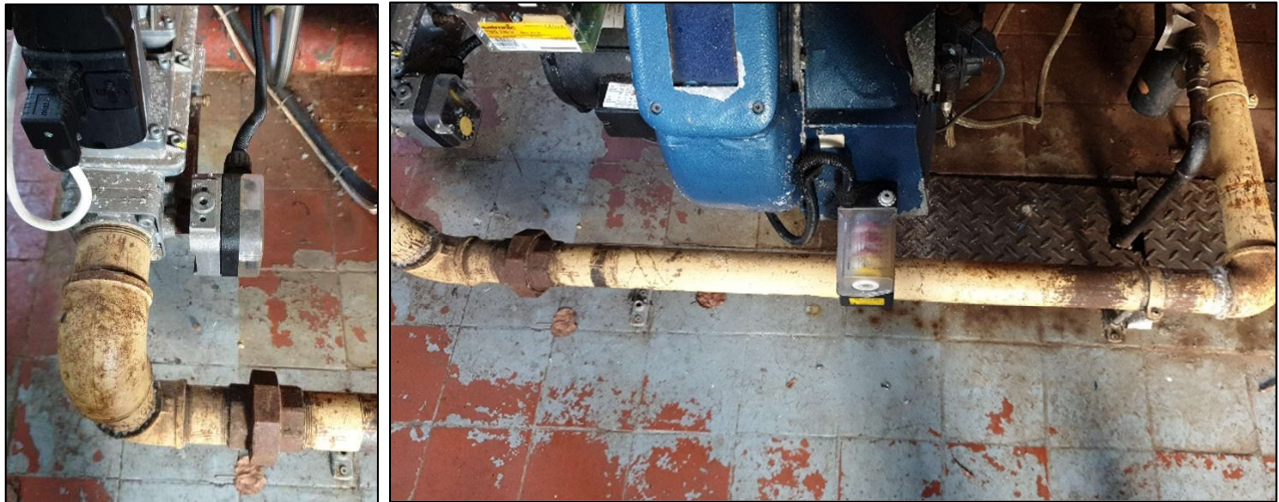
4-inch gas pipework showing end plate and 2-inch boiler feed pipes
